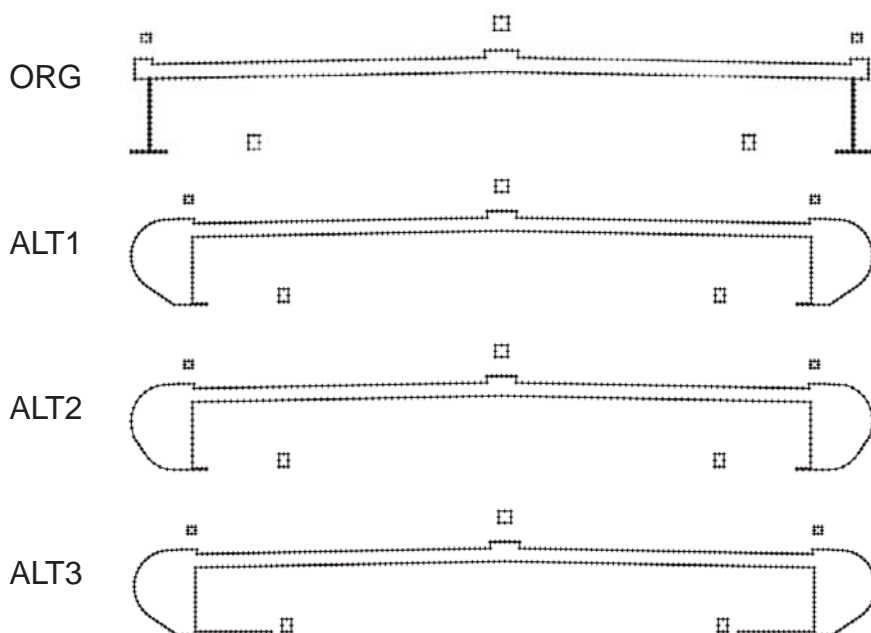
Generic bridge section. Cross section designs studied: original section (ORG), alternative sections with added wind noses (ALT1 - ALT3).
